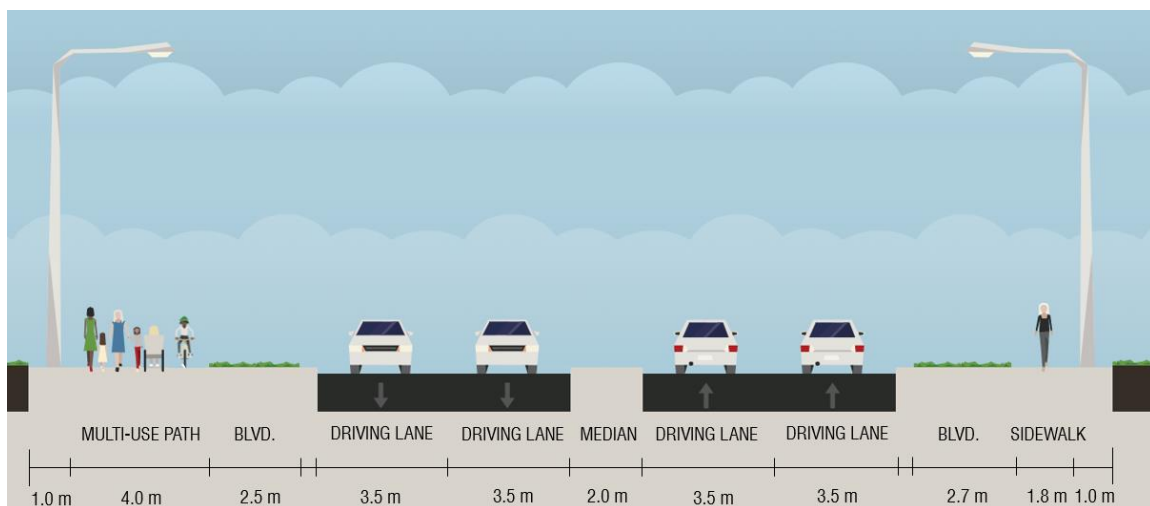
TYPICAL RIGHT-OF-WAY CROSS SECTION
